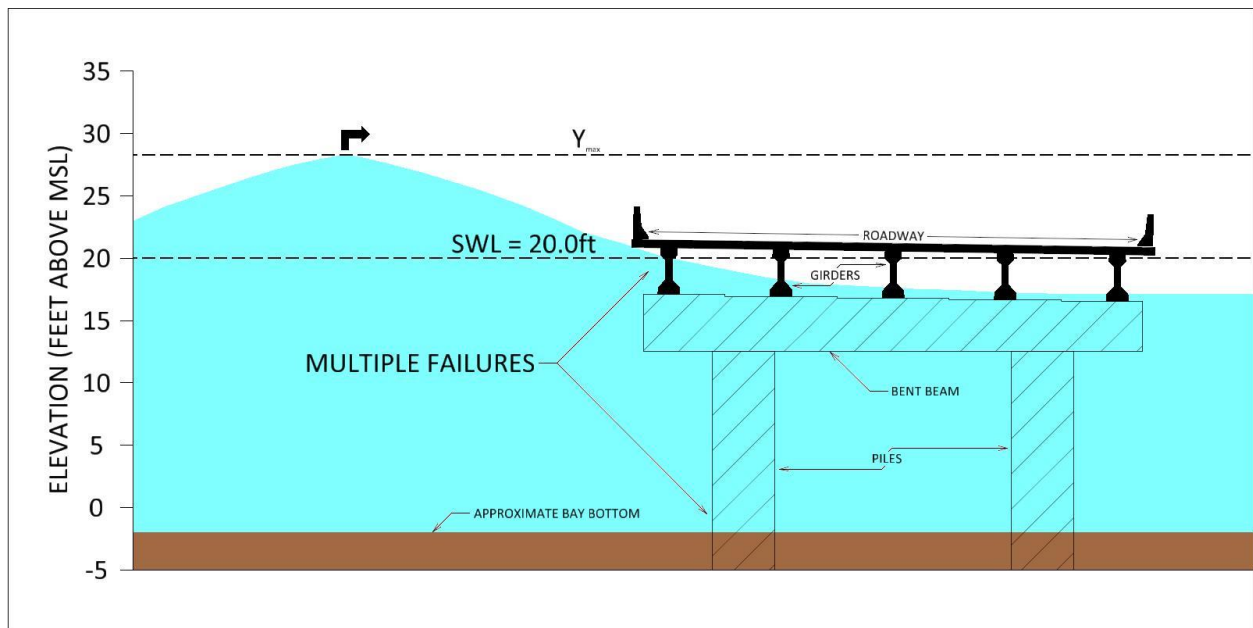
The findings of this study indicate that the bridge will be damaged by failure of the bridge, due to multiple failure mechanisms including pile failure and geotechnical failure in response to the wave-induced loads, when the storm surge reaches about +20 feet (even if the connections and the deck are strengthened).
